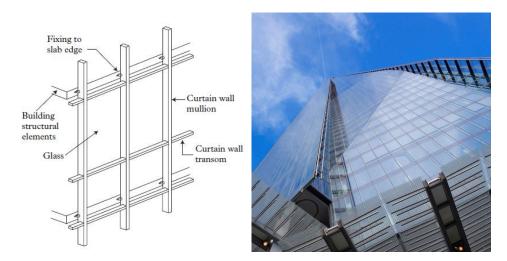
Schematic curtain wall (Kassem et al., 2012) and The Shard Building, London.
